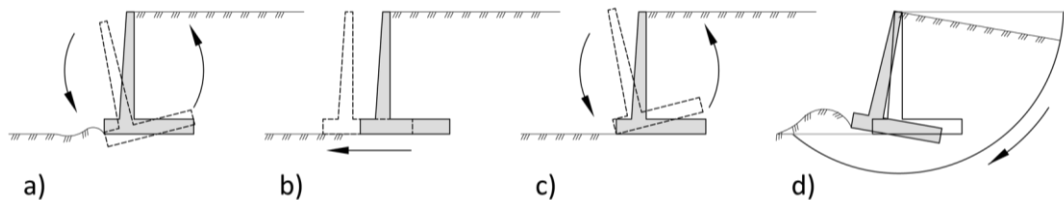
Shows common failure modes of cantilevered retaining walls
